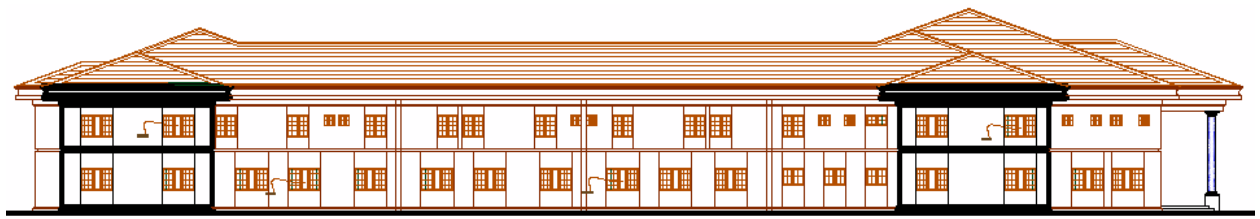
Typical side elevation of Survey & Building Departments showing windows proportions
